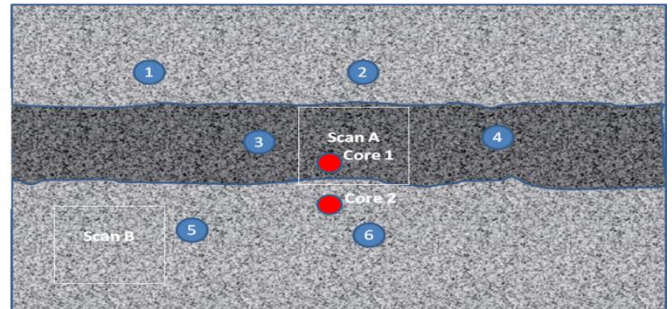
Schematic showing core sample and PUNDIT and Schmidt Hammer test locations
